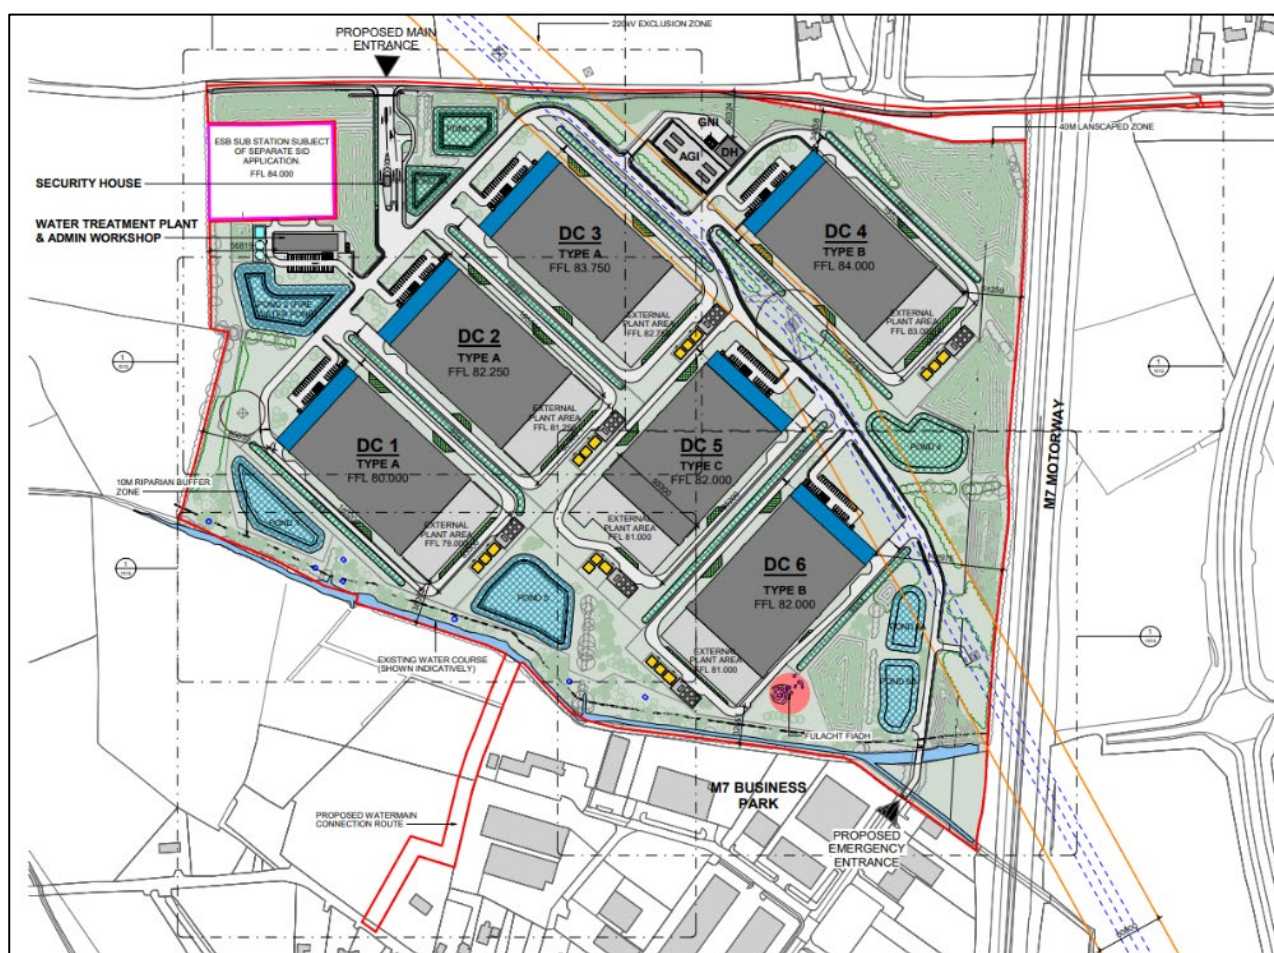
Extract from Proposed Site Plan (Planning Application)
